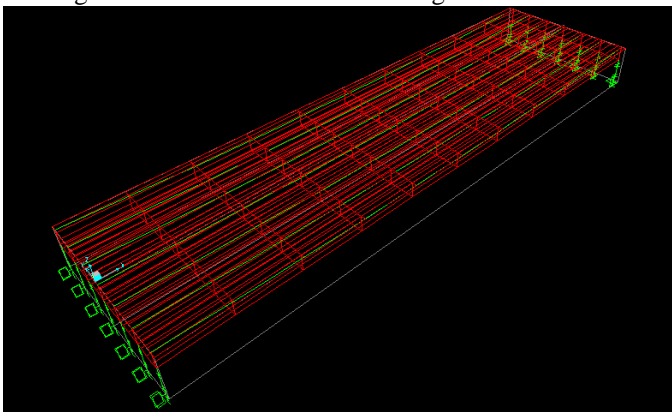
Model Of Voided Slab Bridge In SAP 2000.
